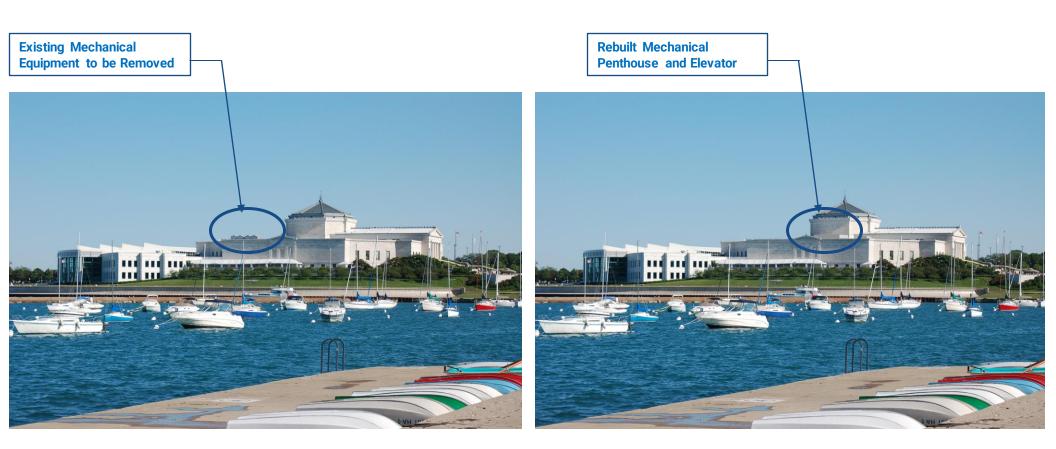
NORTH SERVICE DECK ROOF: 04/22/22
